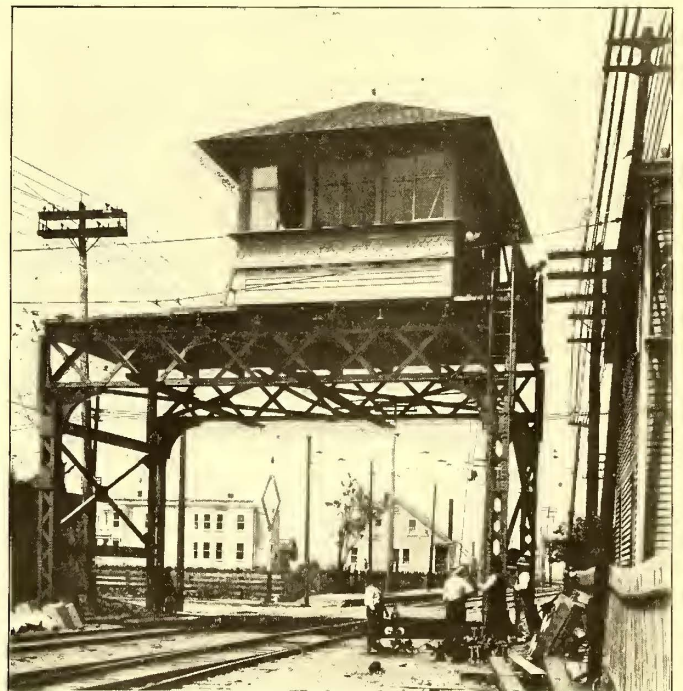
THE ELEVATED SIGNAL TOWER AT THE NORTH ENTRANCE TO THE TERMINAL YARD
